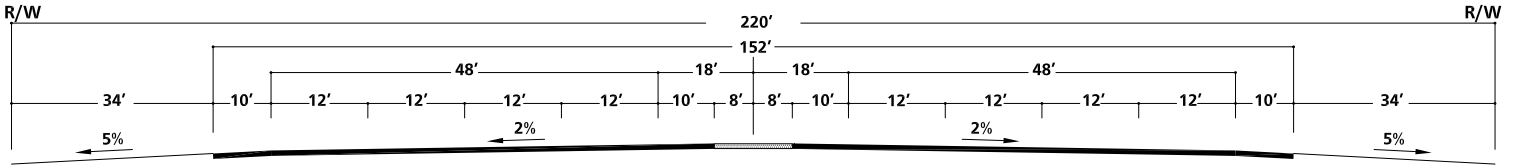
CITY OF CHINO HILLS GENERAL PLAN ROADWAY CROSS-SECTIONS
